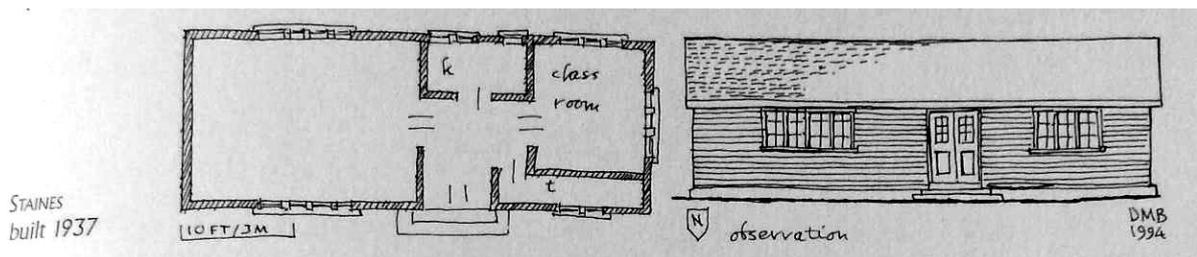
Plan and elevation of the 1937 Staines Meeting House (from Butler Vol. 1, p. 419)
